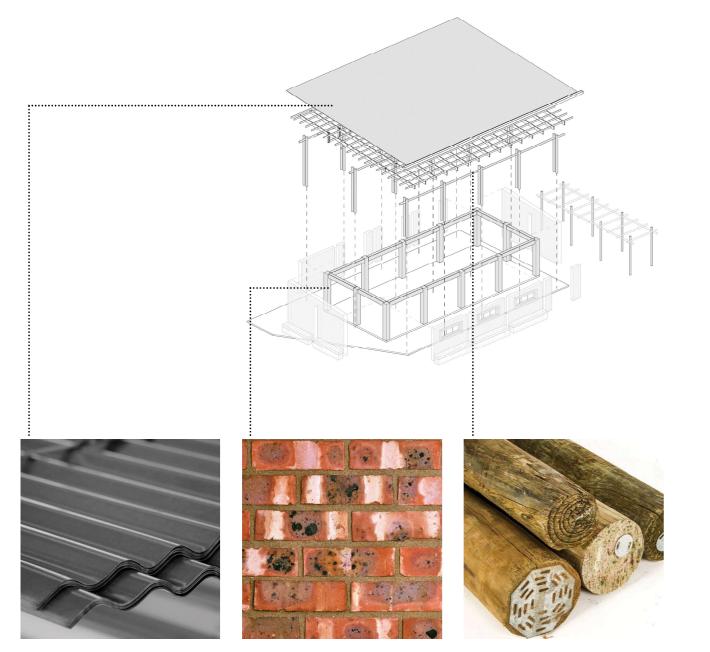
(Top) Primary structure axonometric (Author 2021) Figure 5.15. (Left) Corrugated roof sheeting (Clotan Steel n.d.) Figure 5.16. (Middle) Old cape blend face brick (Corobrik n.d.) Figure 5.17. (Right) Eucalyptus poles (The Pole Yard n.d.)
